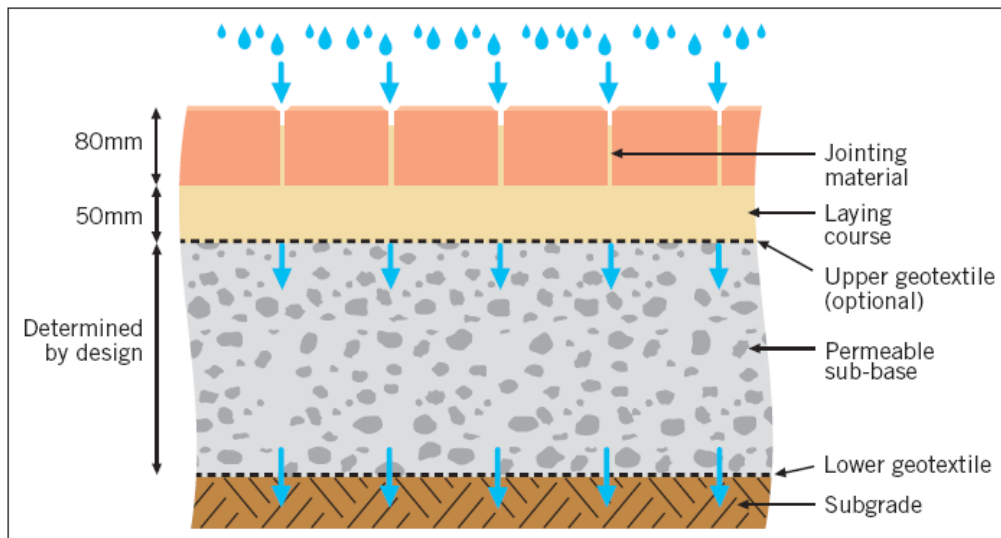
Section through a permeable surface (Source: *Interpave Permeable pavements – guide to the design construction and maintenance of concrete block permeable pavements* dated 2013)
